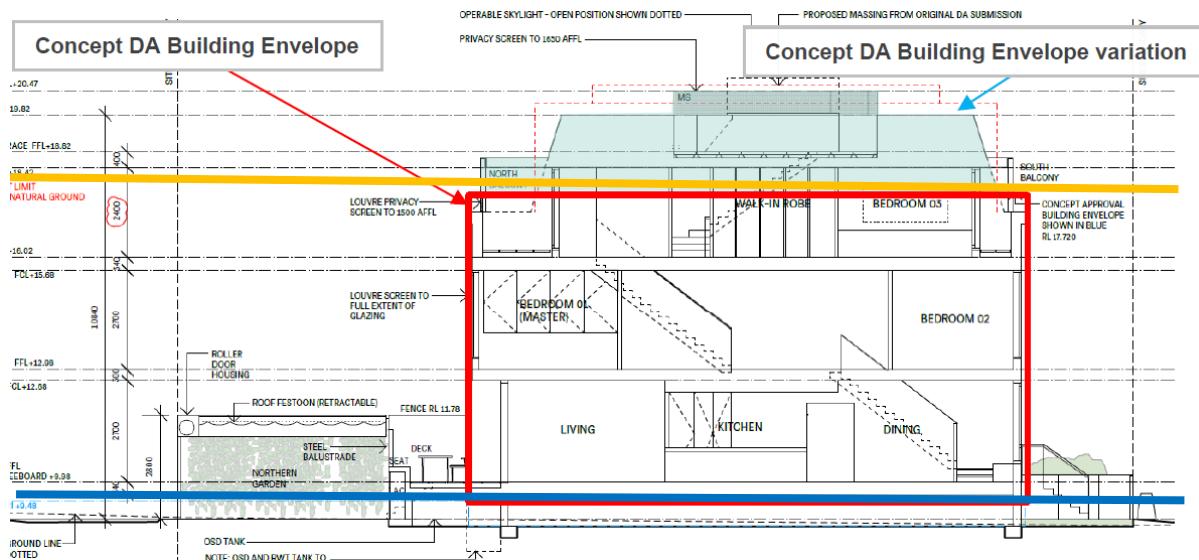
A section plan highlighting the approved building envelope (red), the maximum nine metre height standard (orange) and the flood planning level (blue) with the portion of the building exceeding the envelope in light blue.
